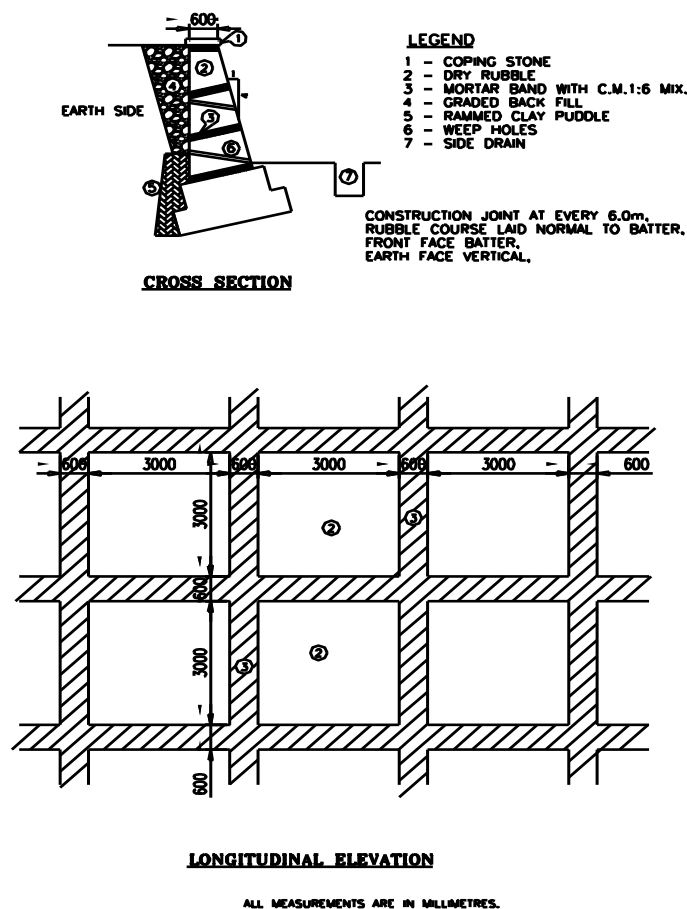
GRAVITY TYPE DRY RUBBLE BANDED WALL
